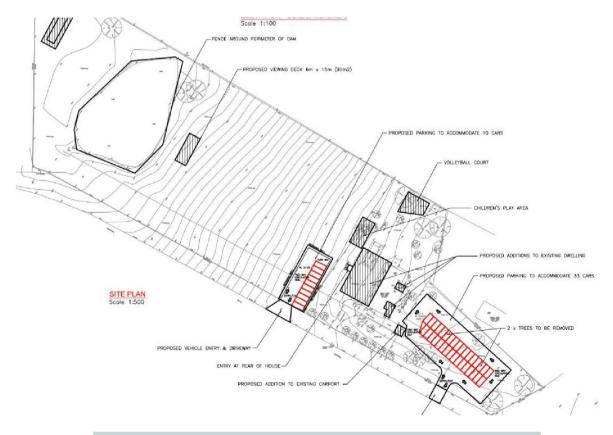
SITE PLAN SHOWING PROPOSED ALTERATIONS AND ADDITIONS
